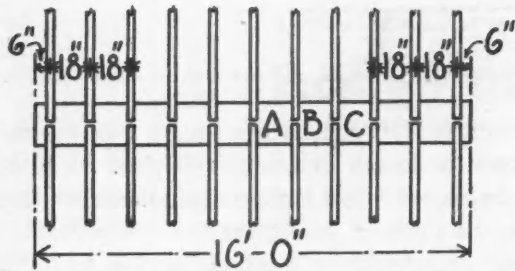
View of Girder Supporting the Floor Beams from Both Sides.
